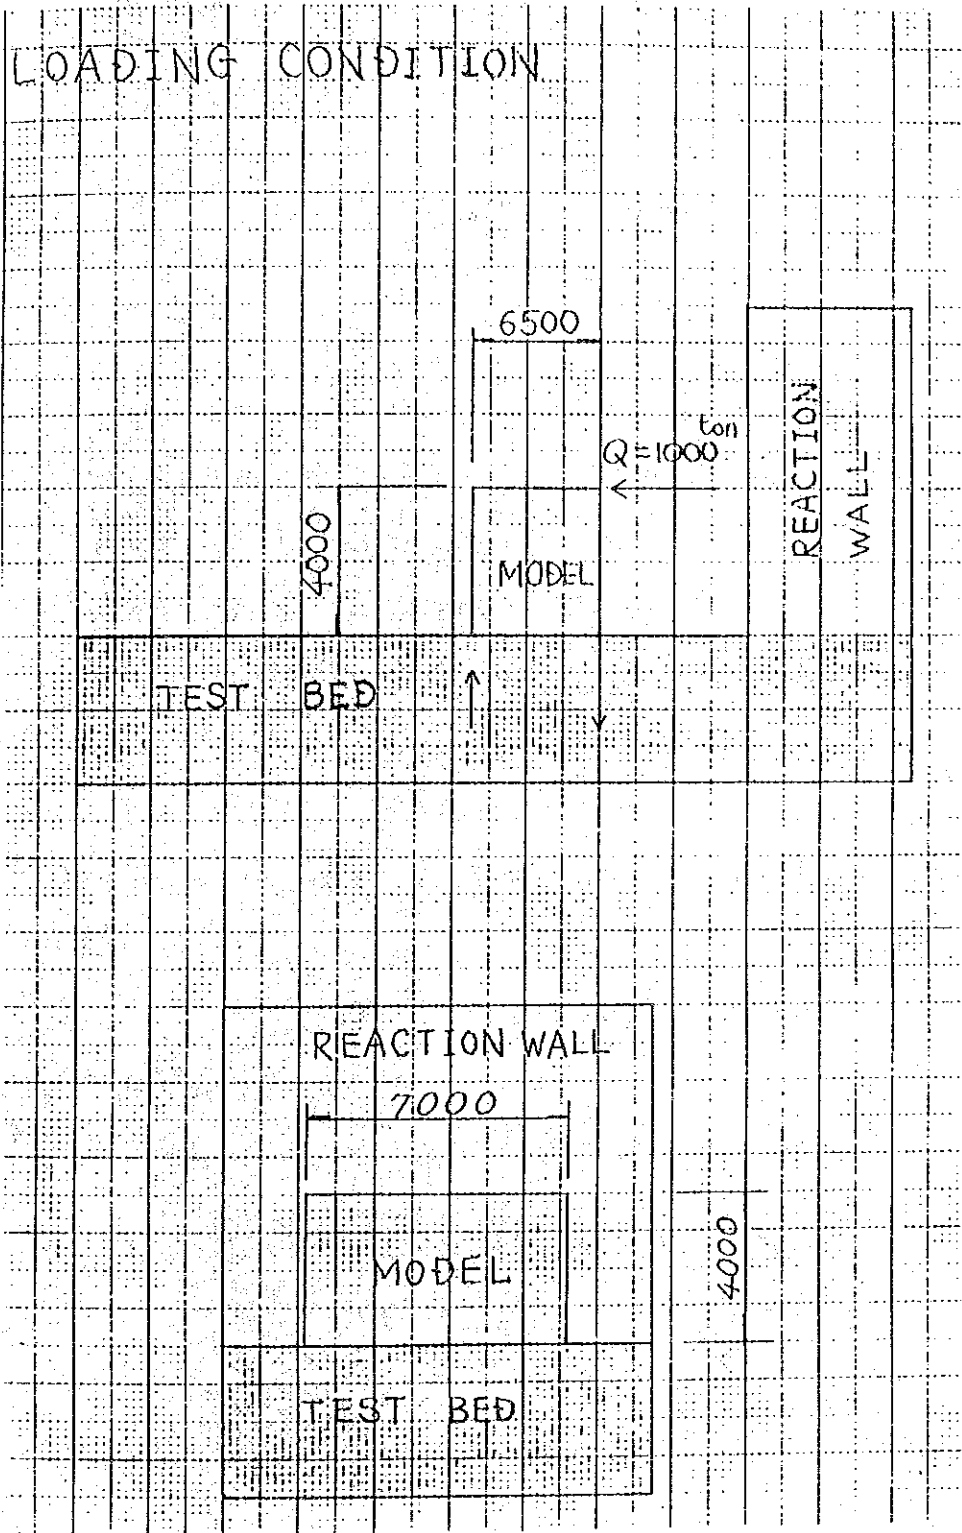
GENERAL VIEW OF REACTION WALL & TEST BED
